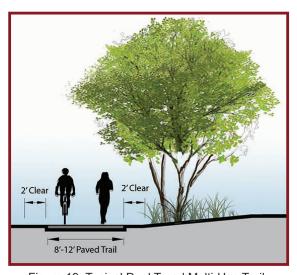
Typical Dual Tread Multi-Use Trail Cross Section
